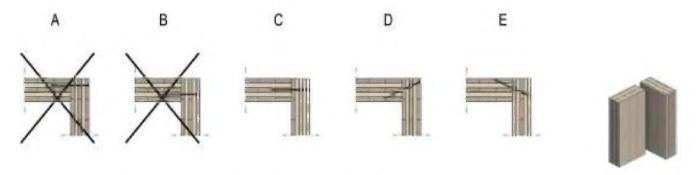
details for screw insertion in wall to wall connections. To be avoided: A, B; Recommended but very difficult: C; Recommended: D,E.
